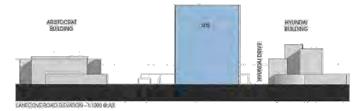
Elevations showing the amended LEP Envelope Source: Group GSA
